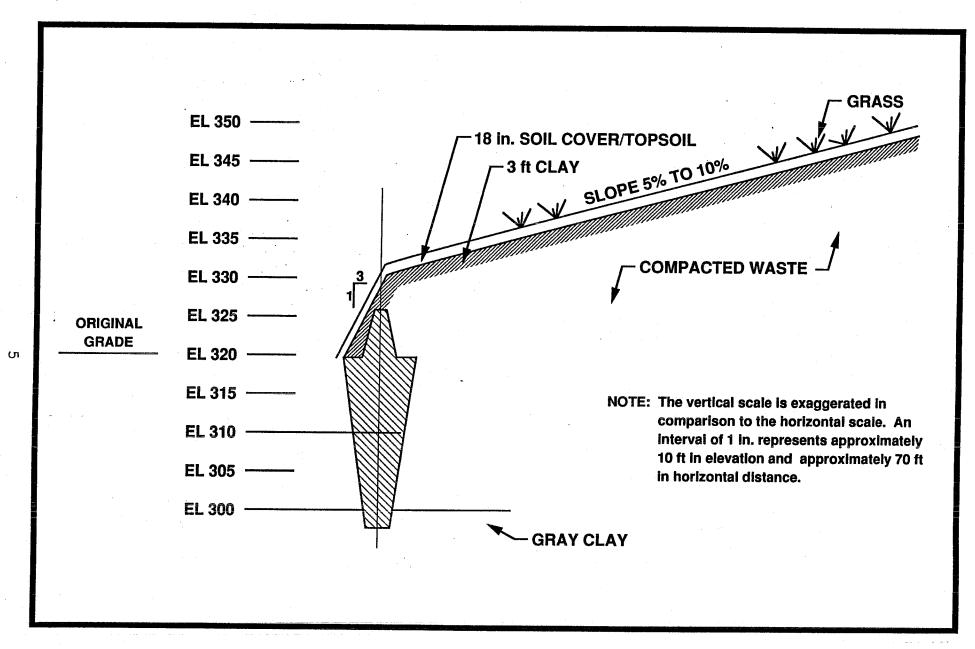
CROSS SECTION OF THE NFSS WASTE CONTAINMENT STRUCTURE
